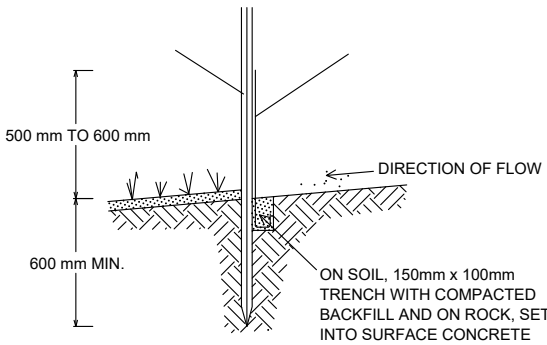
TYPICAL SEDIMENT FENCE NOT TO SCALE
